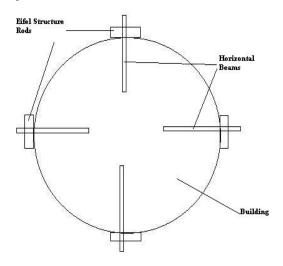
Cut section top view of building with MegEifel rod at side. MegEifel rods further have horizontal beams at each floor.
